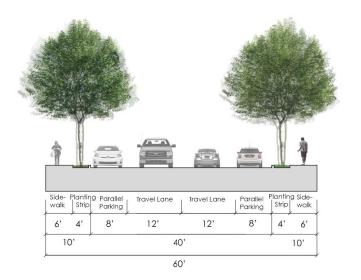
North Pioneer Street section from Lowell Downtown Master Plan.
